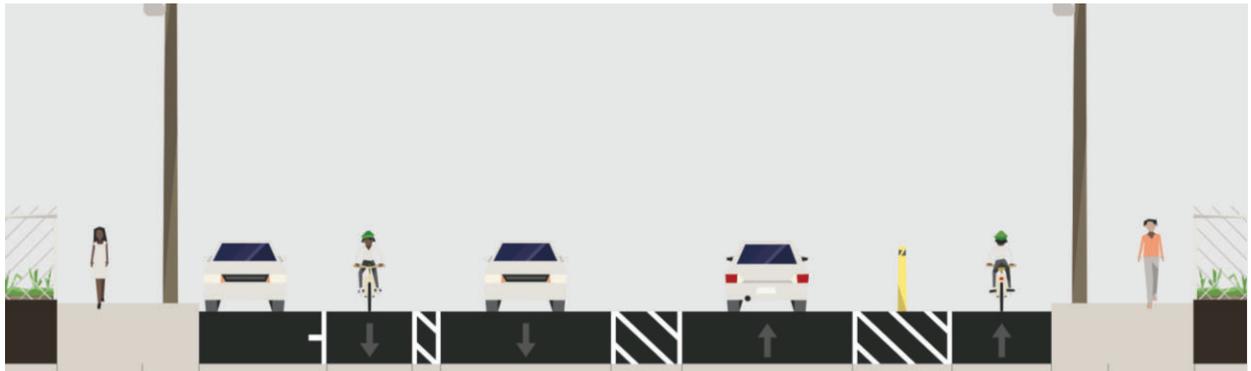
Proposed Cross Section of Evans Avenue between Cesar Chavez and Napoleon streets, looking northwest
